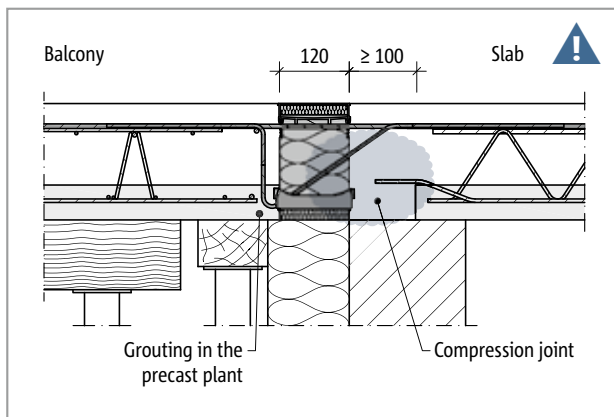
Schöck Isokorb® XT type K: Direct support, installation in conjunction with element slabs (here:  $h \leq 180$  mm), compression joint on floor side
